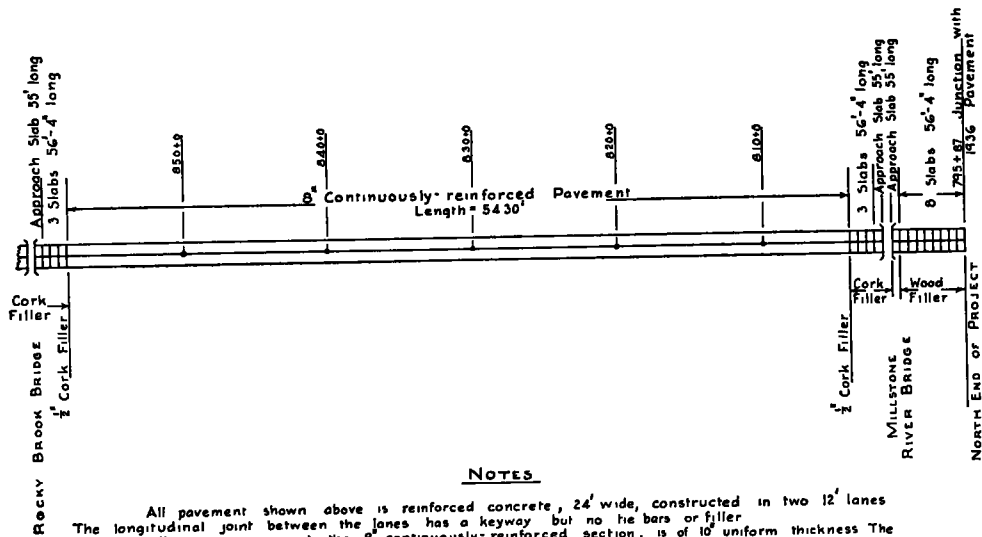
shows a general layout of the northerly section. This section is 5430 ft.
